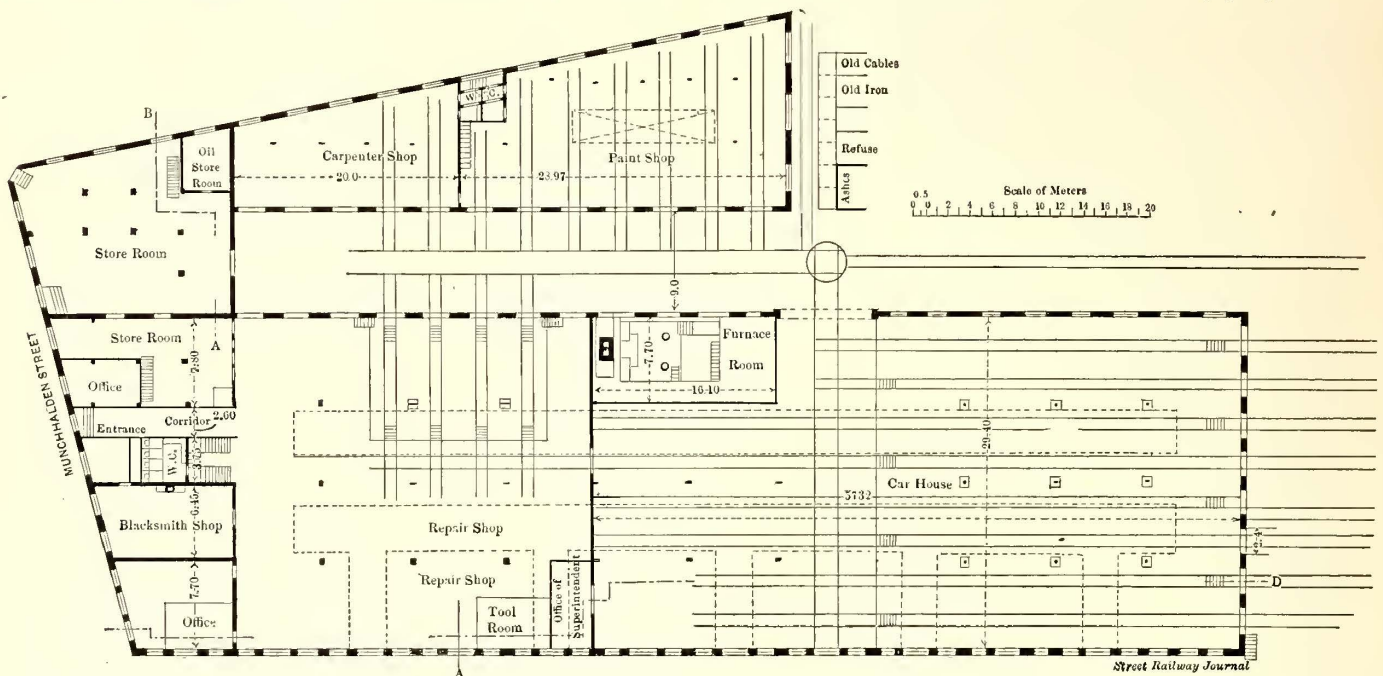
PLAN OF CONCRETE CAR HOUSE IN SEEFELDSTRASSE
